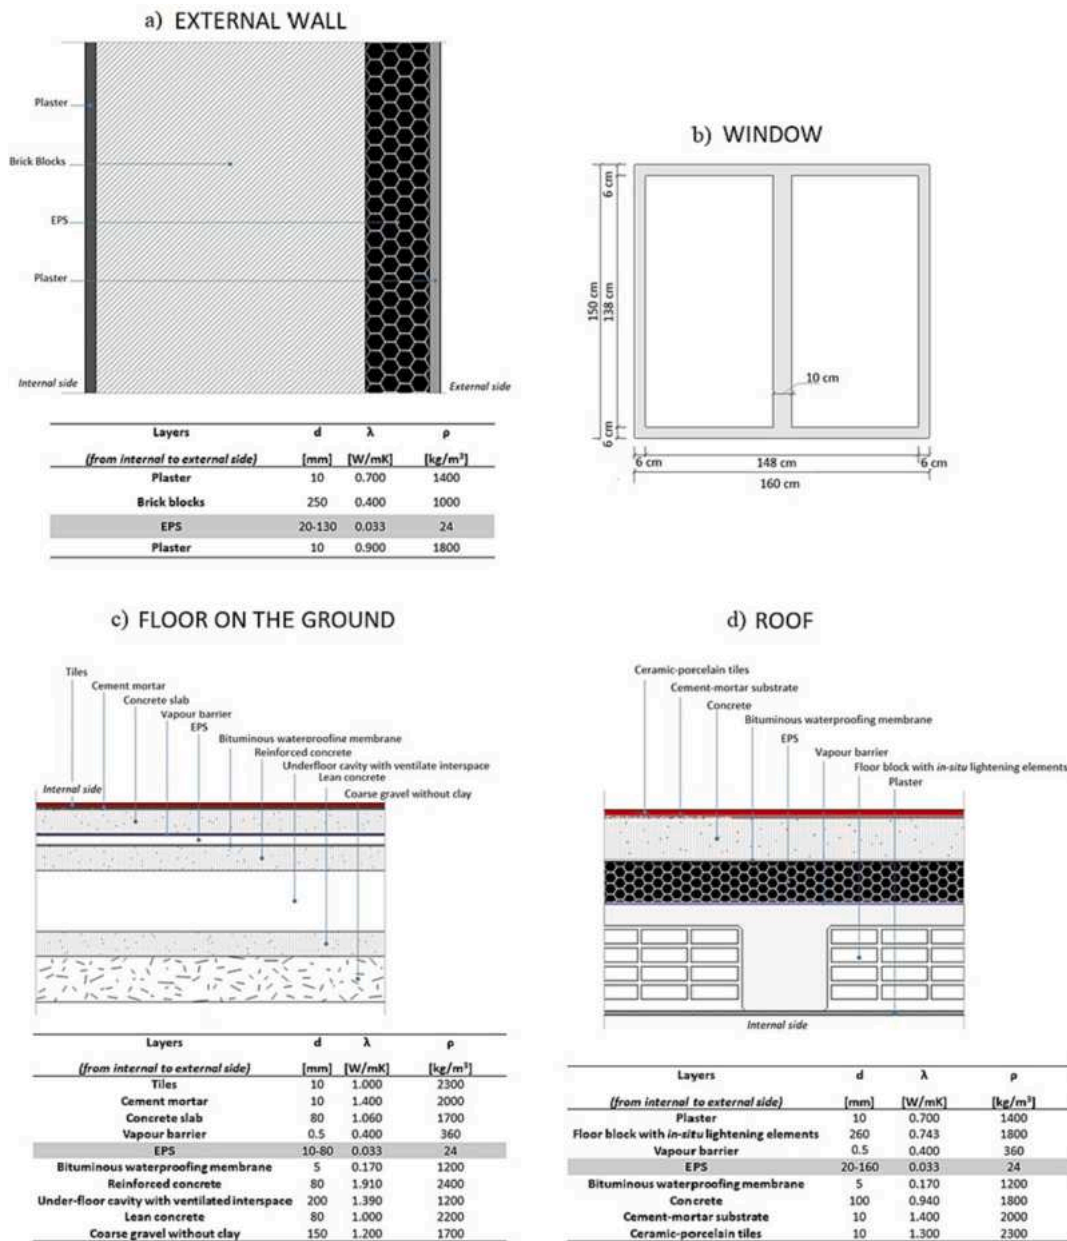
Thermal and geometric characterization of the building envelope: external wall (a), window (b), floor on the ground (c), roof (d).
